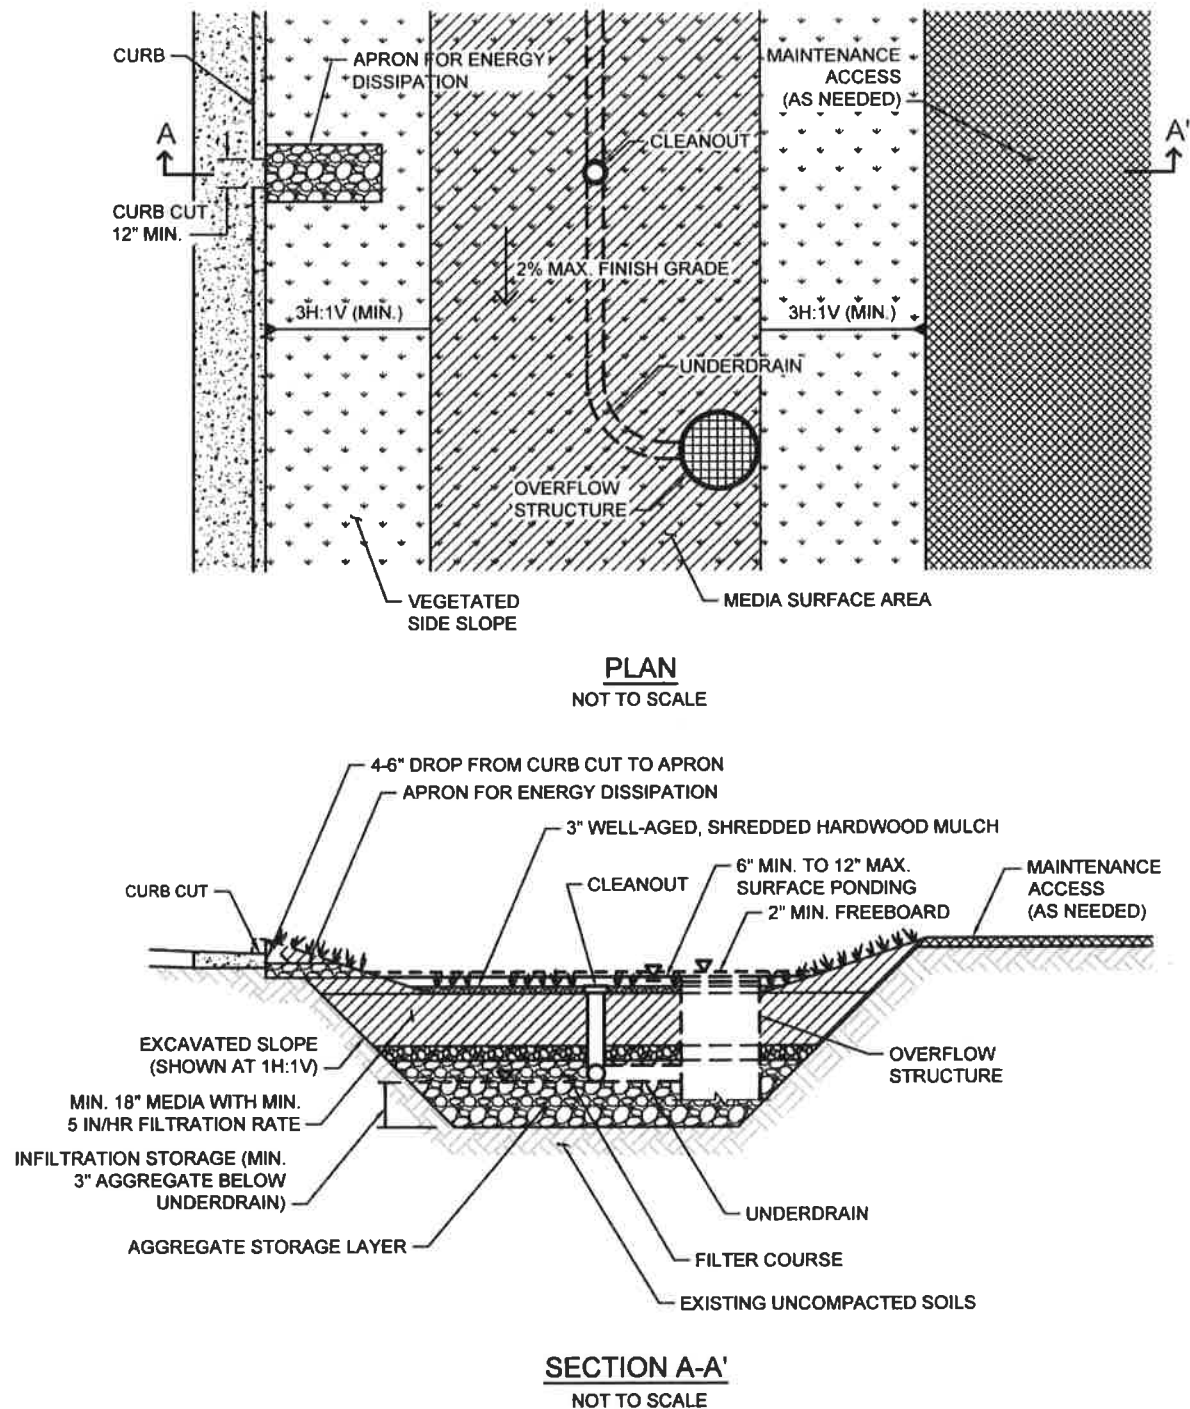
E.12-1: Typical plan and Section view of a Biofiltration with Partial Retention BMP
